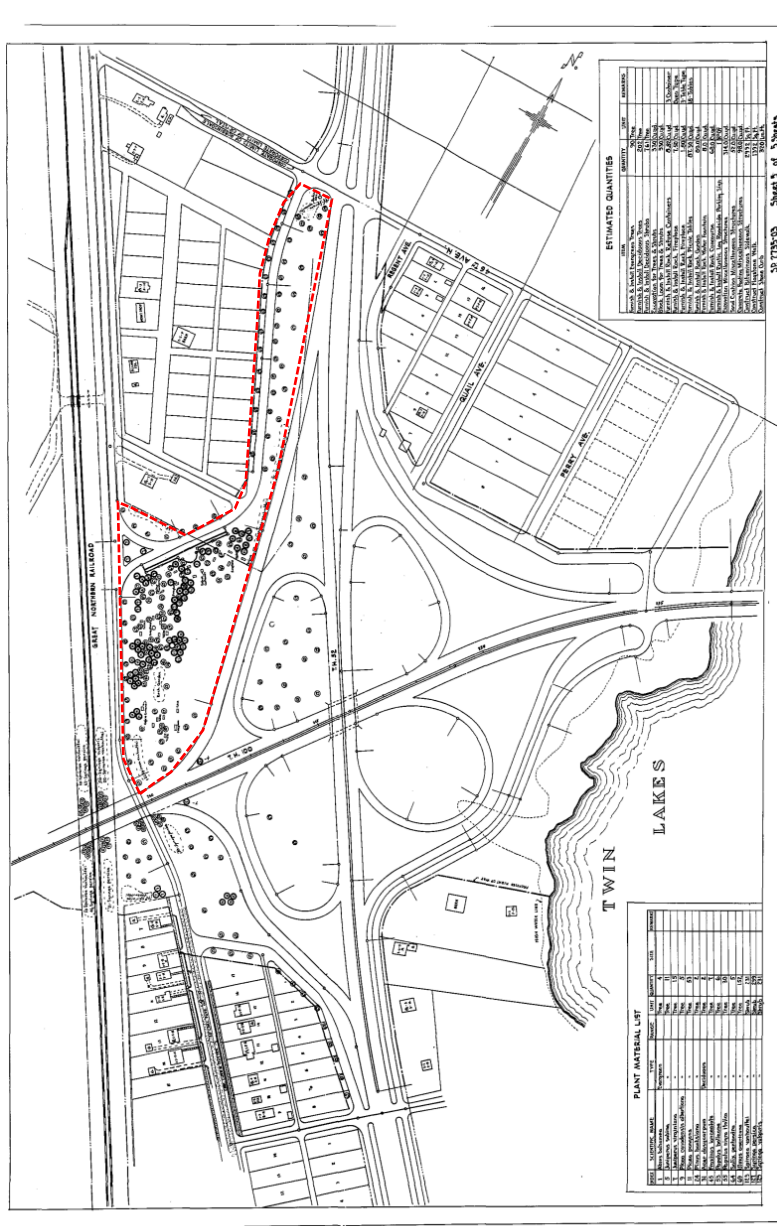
Graeser Park (red dashed outline). Planting Plan, 1941. State of Minnesota Department of Highways. Roadside Development Plans. Trunk Highway No. 100-130. SP 2735-03. Sheet 5 of 5.
